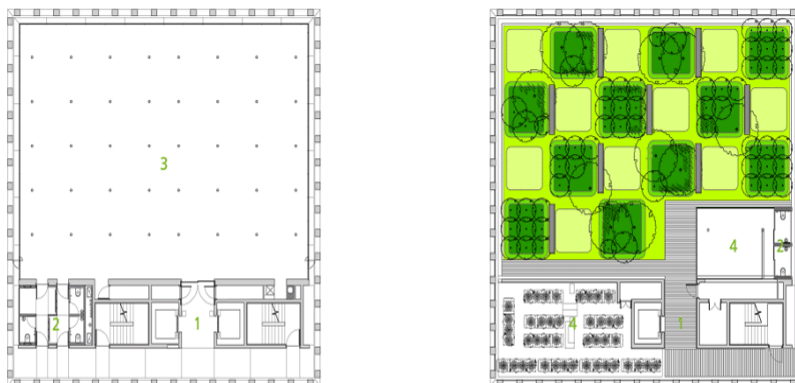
Typical Floor Plan and Roof Garden Plan of Urban Hive Building
